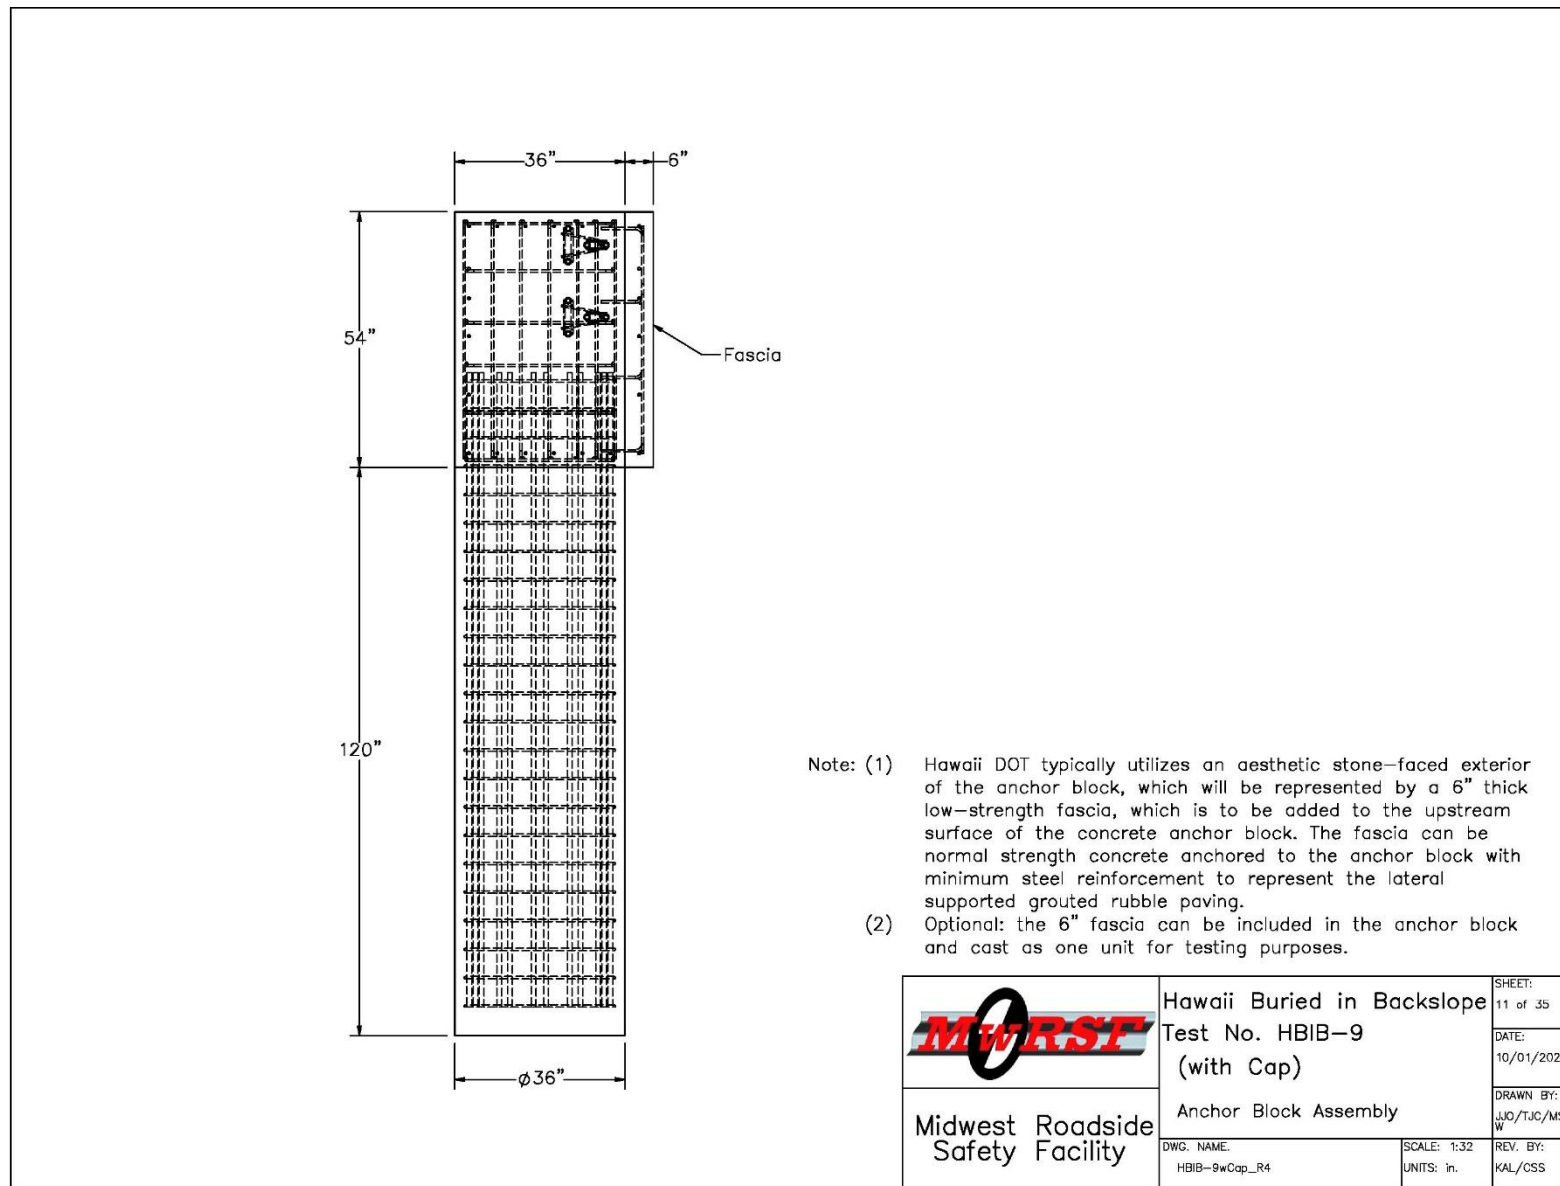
Anchor Block Assembly, Test No. HBIB-9
